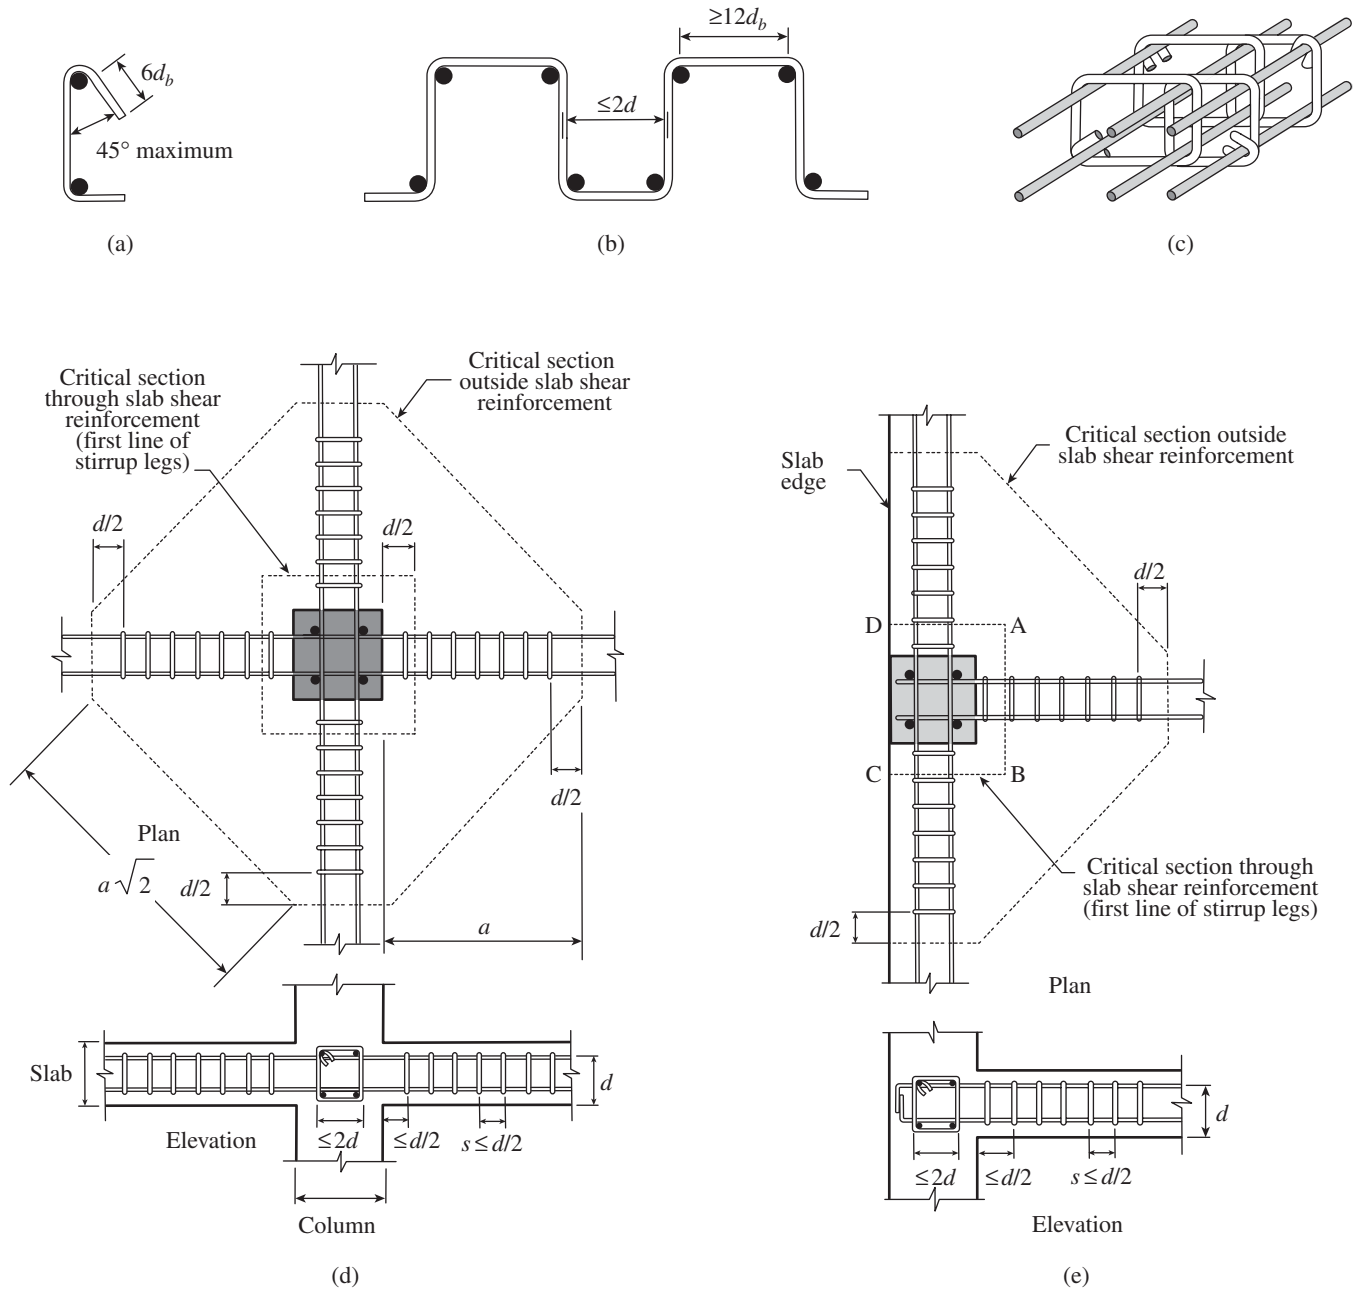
Stirrup-type shear reinforcement in flat slabs as per ACI 318 (a) Single-leg stirrup (b) Multiple-leg stirrup (c) Closed stirrups (d) Arrangement of shear stirrup reinforcement—interior column (e) Arrangement of shear stirrup reinforcement—edge column (Reprinted with permission from ACI)
